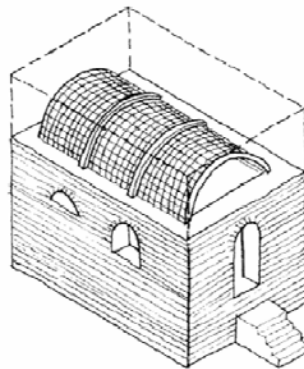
Sketch of Curved-Roof Construction (Single Vault)²⁹³
